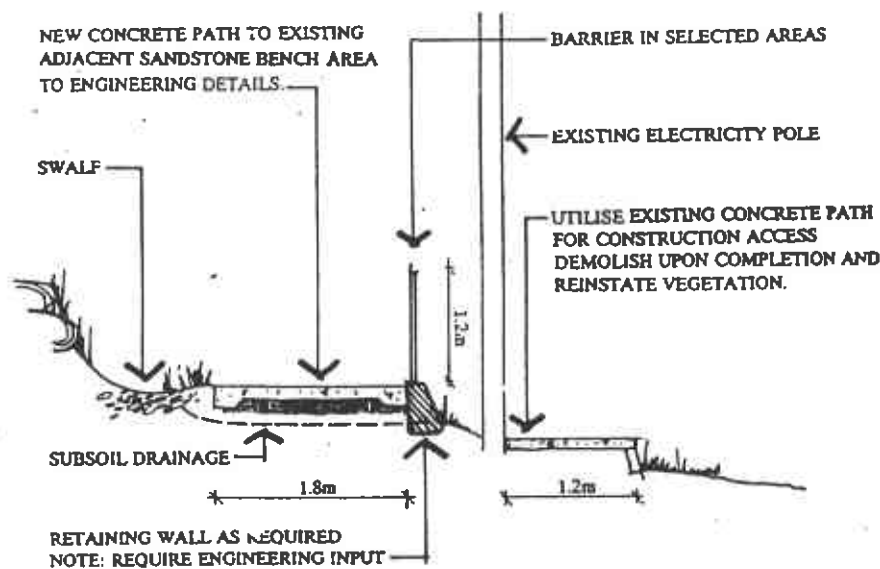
New concrete path between Fishing Club and Tower Street Steps.
